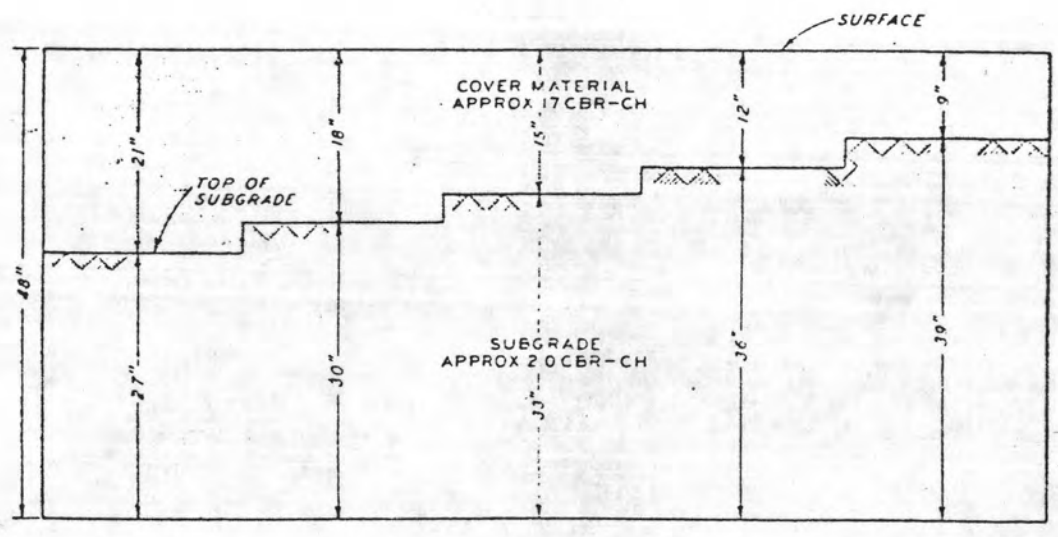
LAYOUT OF TEST SECTION 1 LANES 1, 2, 3 AND 4
